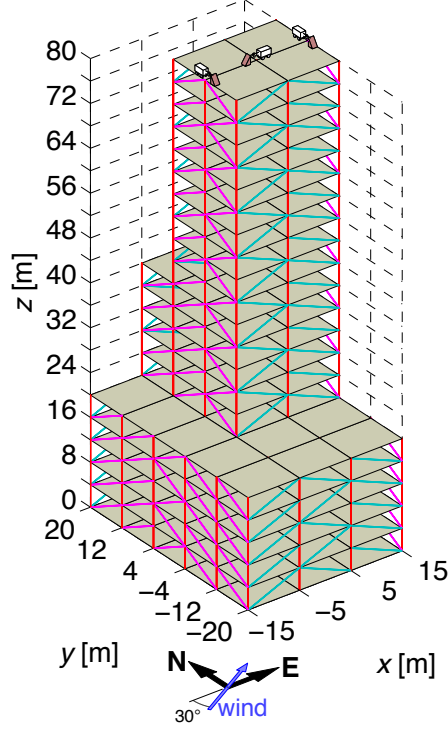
A 20-story building model with three tuned mass dampers at its roof used in Example III.
